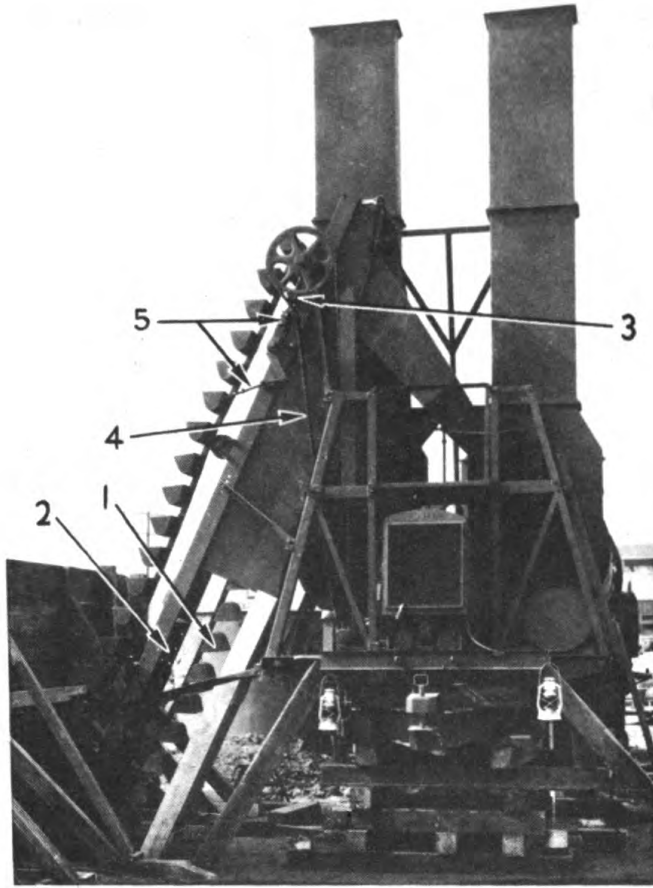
ADJUSTMENT OF COLD ELEVATOR DRIVE CHAIN AND BUCKET CHAIN.
